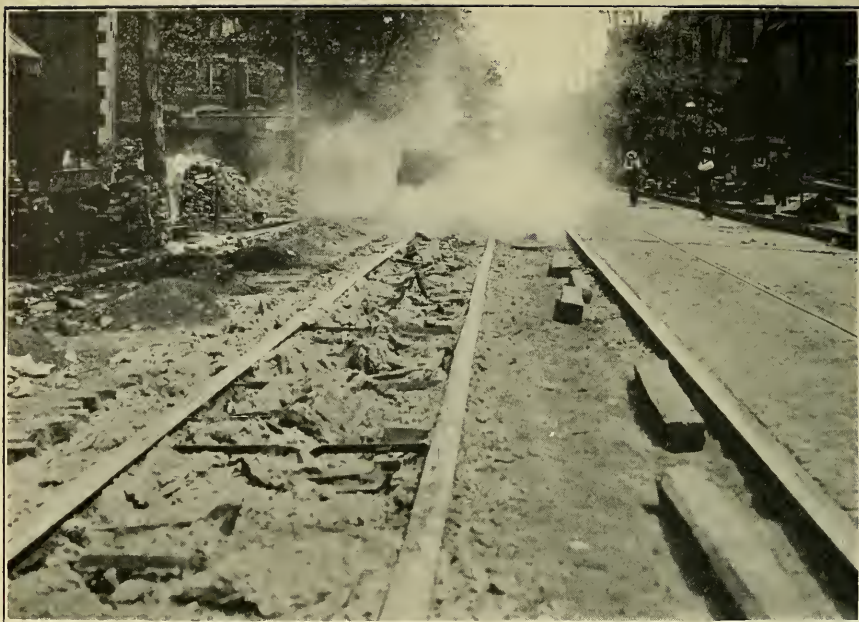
BLASTING CONCRETE IN OLIVE STREET.
